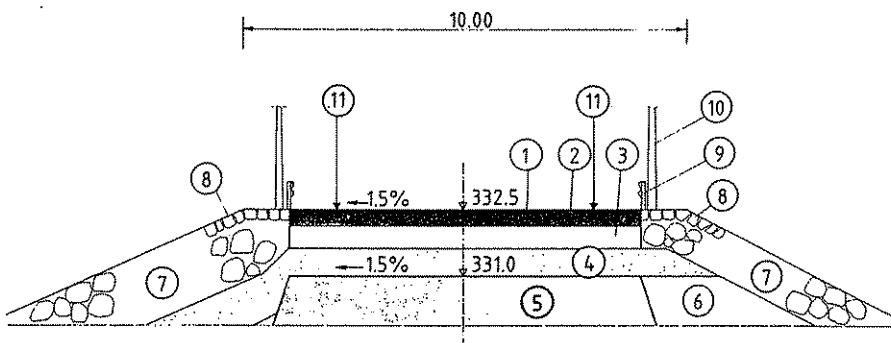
Rockfill dam with vertical earth core. Example of crest design (dimensions in m, courtesy of LI).
